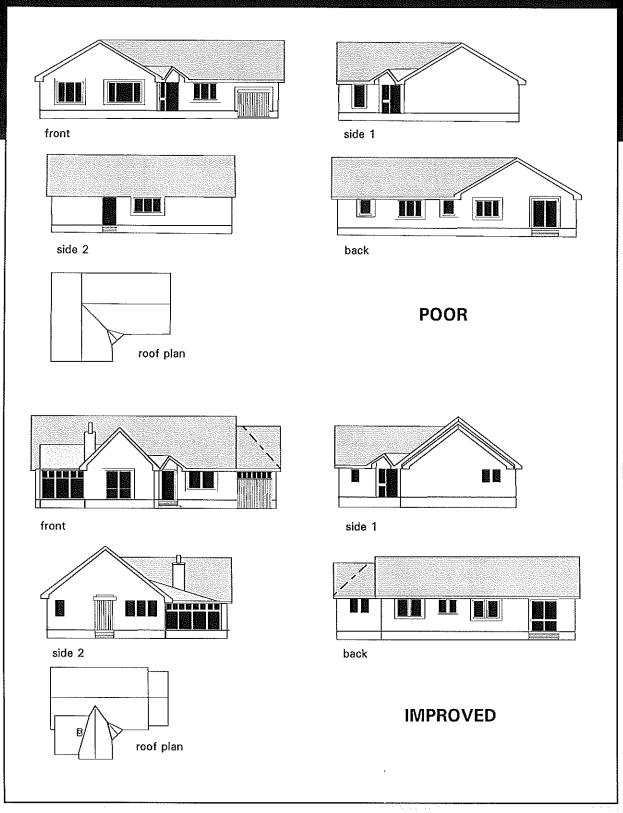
HOUSE DESIGN MODIFICATION A: BLAND ORIGINAL
